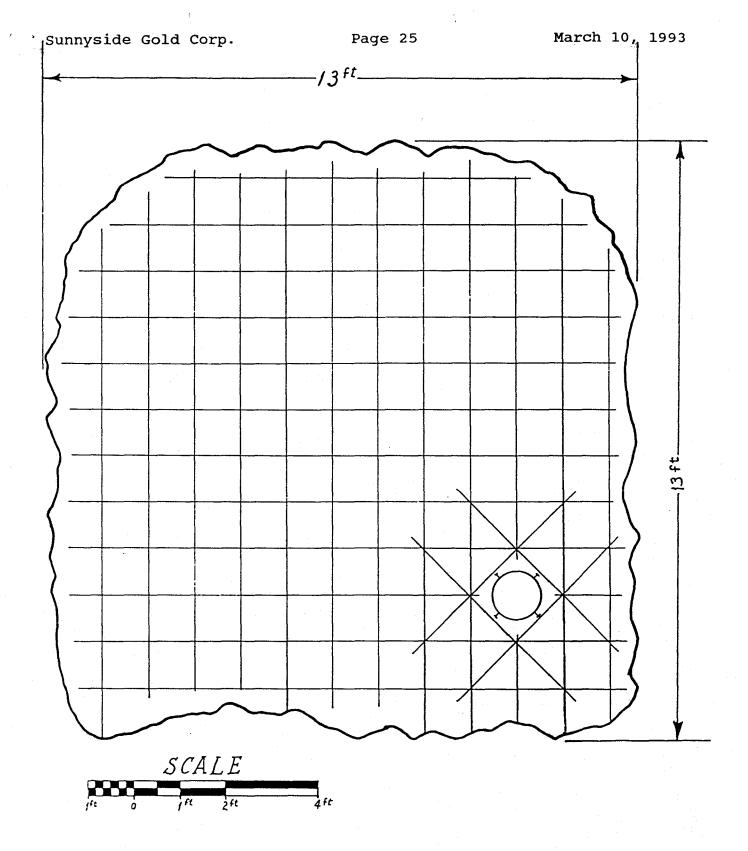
Water-side rebar cage (mat) for shrinkage and temperature control in the American Tunnel, #6 bars, 12-in. spacing, 3-in. minimum depth of cover.
